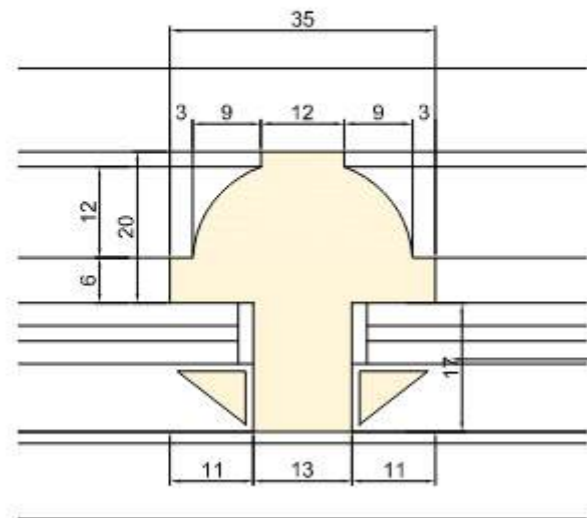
Example of the style considered for replacement on Ground and First floors
